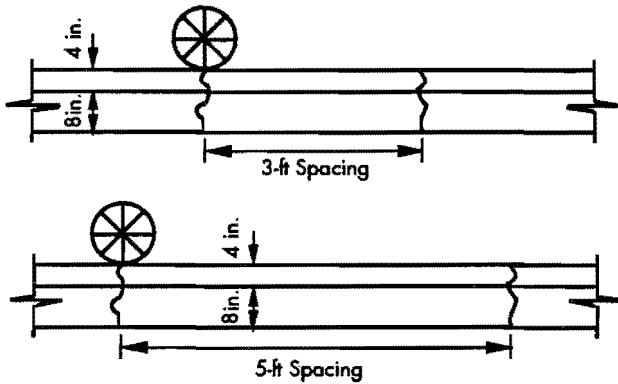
Wheel load position and stress distribution for typical crack spacings in BCO with load between cracks
